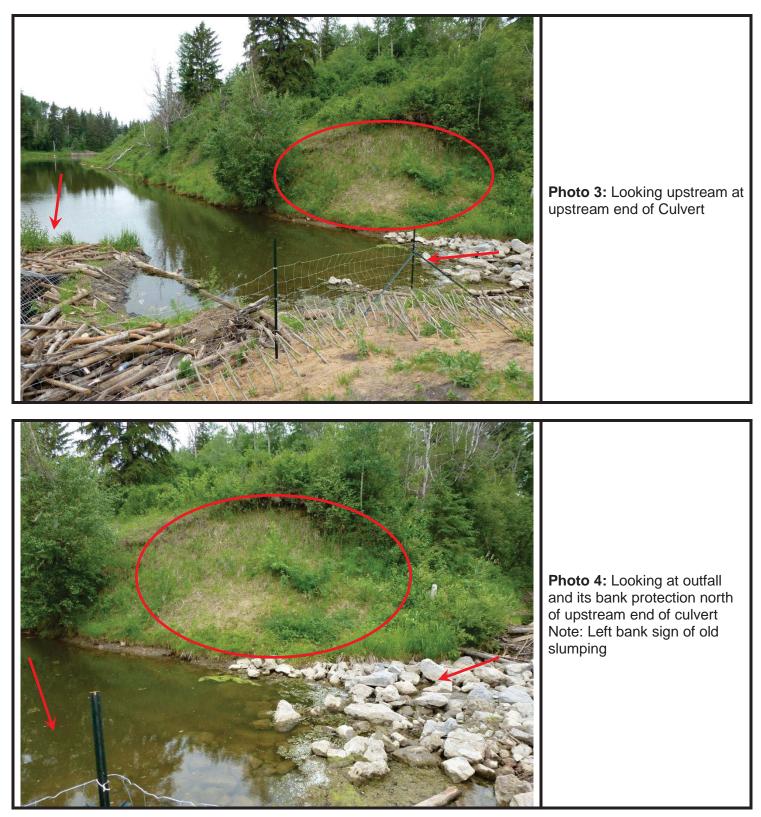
Looking at outfall and its bank protection north of upstream end of culvert Note: Left (north) bank sign of old slumping
